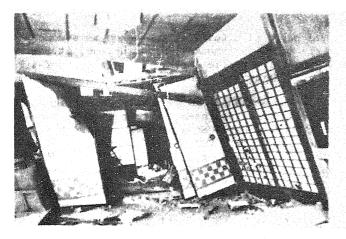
Scarcely any useful wall can be seen Photo.6. Zig-zag crack inside of this house. Lintels and hangwalls were helpless to avoid large inclination.
